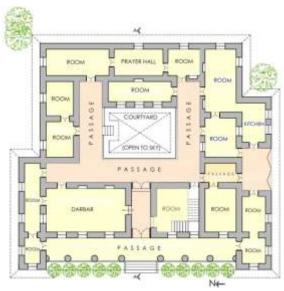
a: Ground floor plan of house of the elite class, Sawantwadi. Source: Author
